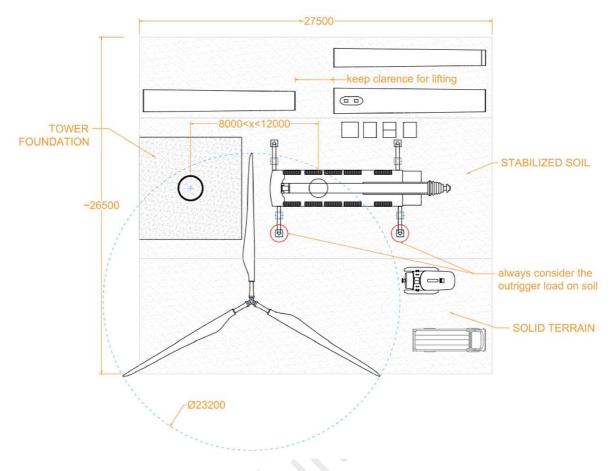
Indicative site layout – Northern Power Systems 95 kW turbine.
